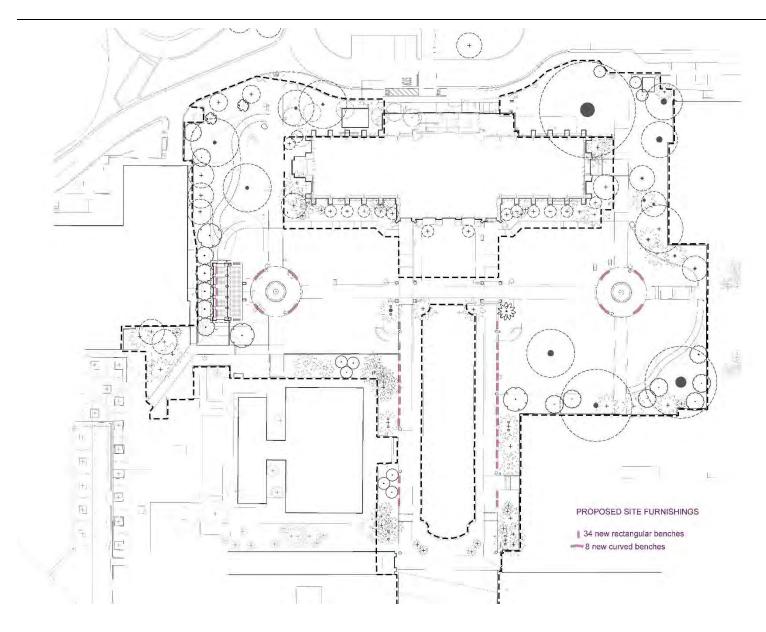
Proposed Site Furnishings. Courtesy of Spurlock Landscape Architects.
